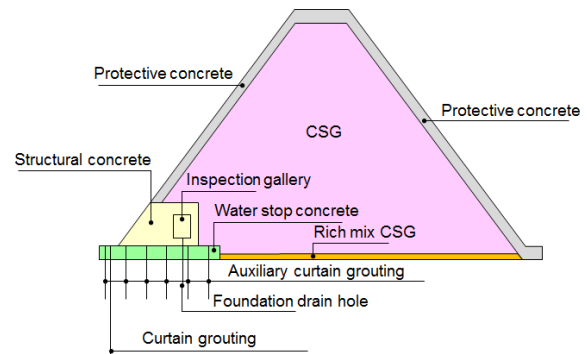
Structure of a trapezoid-shaped CSG dam (schematic figure of the body section)
